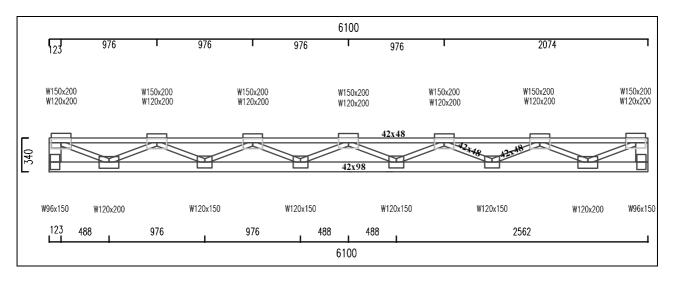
Truss used in the floor of figure 1 -dimensions of the trusses used in the tests [1], [3].
